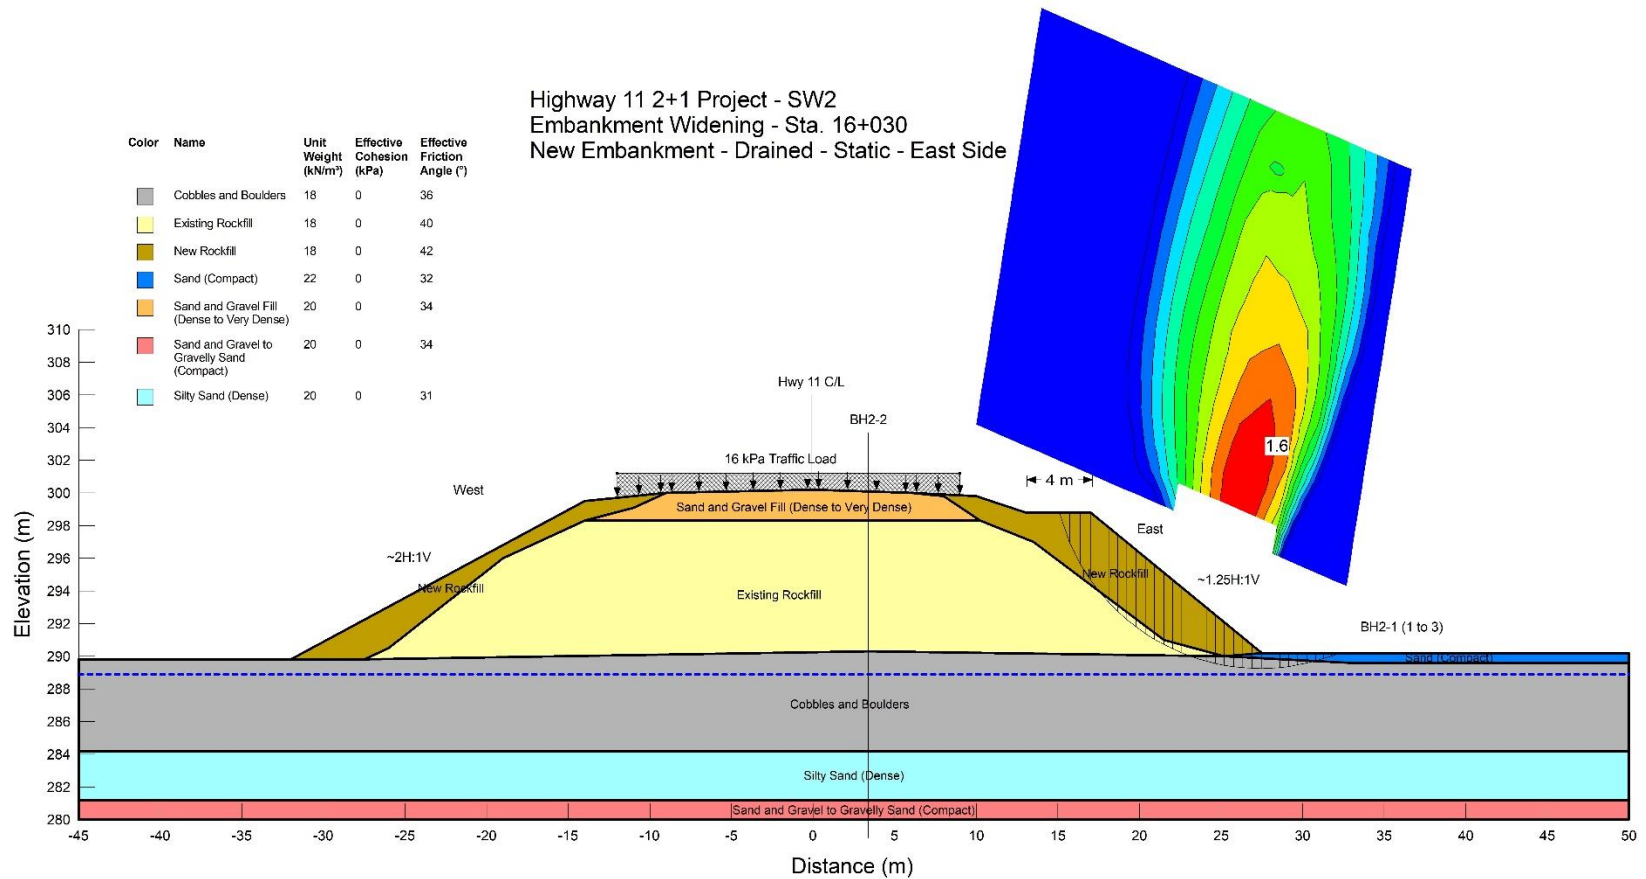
Slope stability analysis for Sta. 16+030 east side of embankment (1.25H:1V) – drained, static condition
